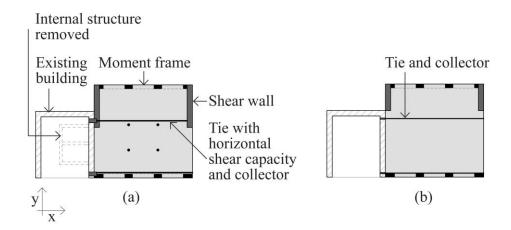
Plans of an idealized existing and new building joined together. In (a) structure in the new building is adequate for both buildings in both directions, while in (b) the existing building has sufficient strength in the y- direction but is supported by the new building in the x-direction.
